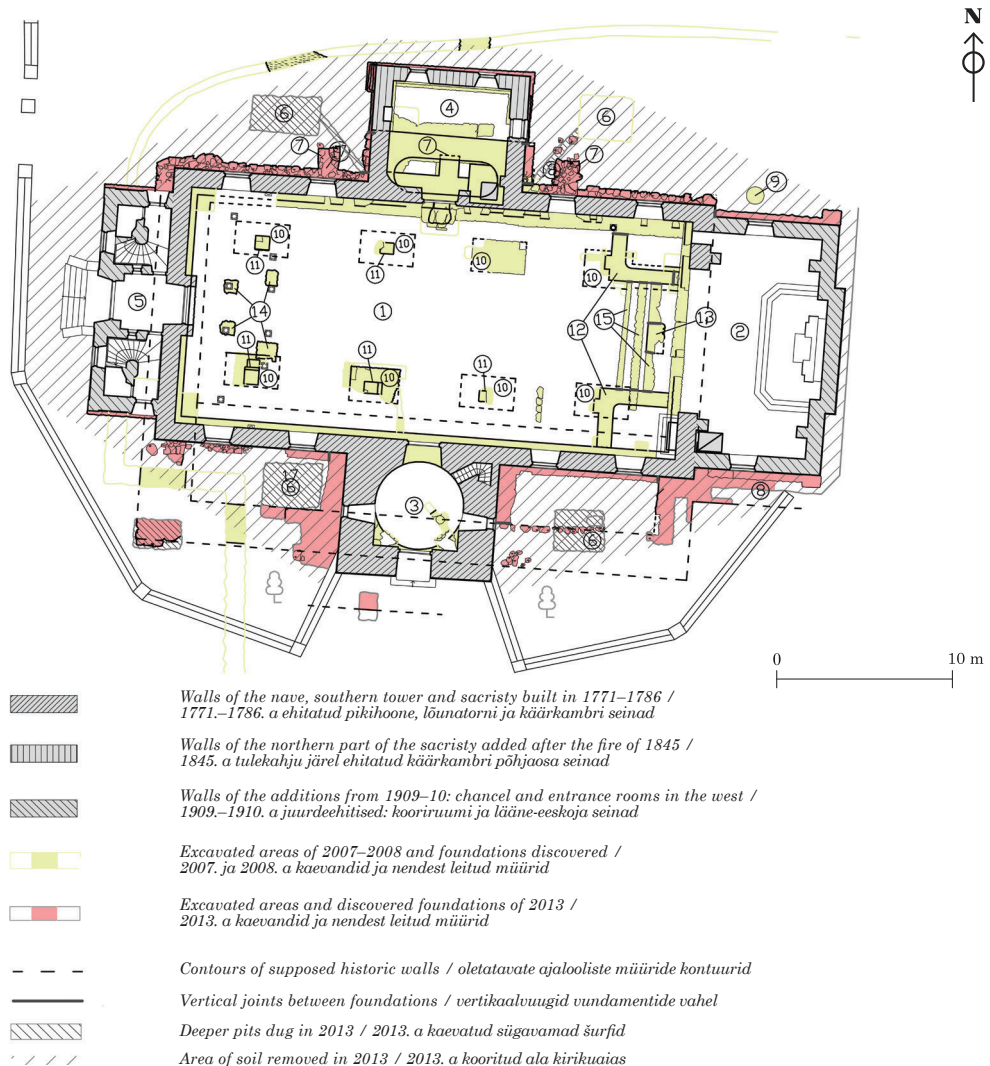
Plan of the church and churchyard with results of excavations of 2007–2008 and 2013. 1 – church nave from 1771–86, 2 – chancel from 1909–10, 3 – south tower, 4 – sacristy, 5 – entrance rooms, 6 – drainage pits, 7 – foundations of buttresses, 8 – foundation of medieval chancel, 9 – limestone base of a column, 10 – reconstruction of larger pillar foundations, 11 – reconstruction of smaller pillar foundations, 12 – L-shaped foundations, 13 – foundation of baroque altar, 14 – foundations of earlier posts of organ balcony, 15 – foundations of altar rails.
